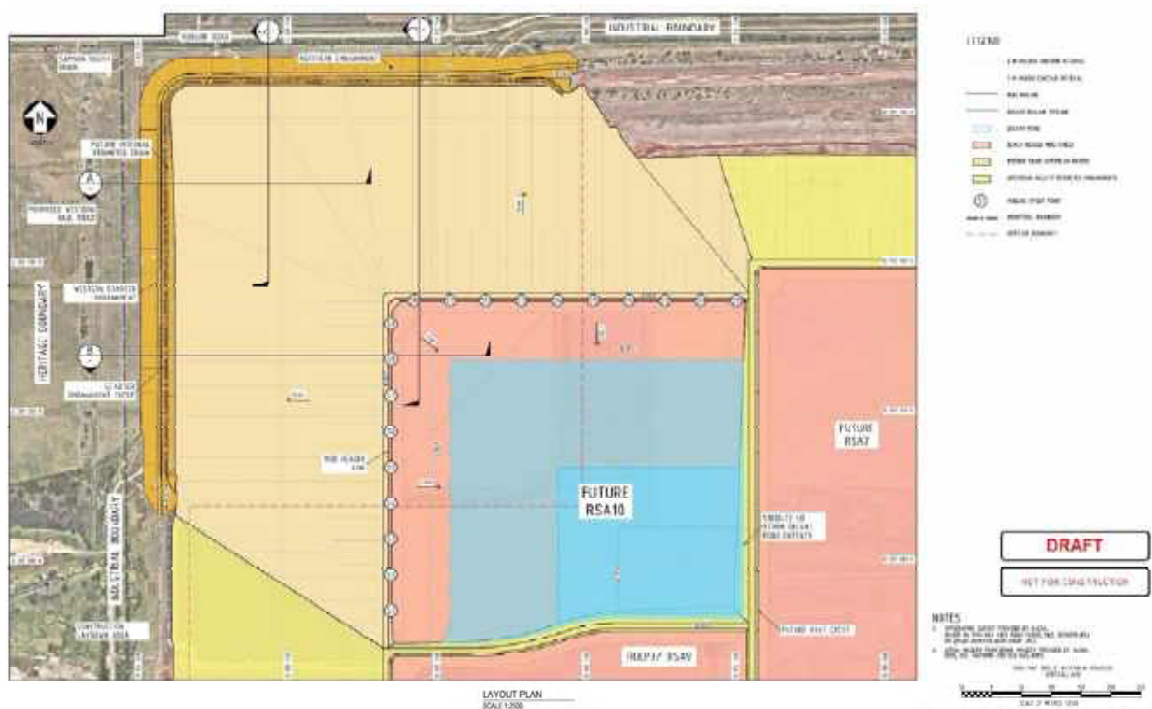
RSA10 Layout with Type Section for Stability Analysis
